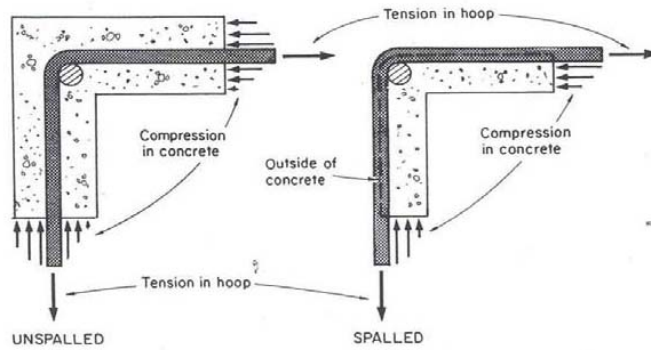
Spalling of Concrete Cover (ACI Committee 445, 2006)
